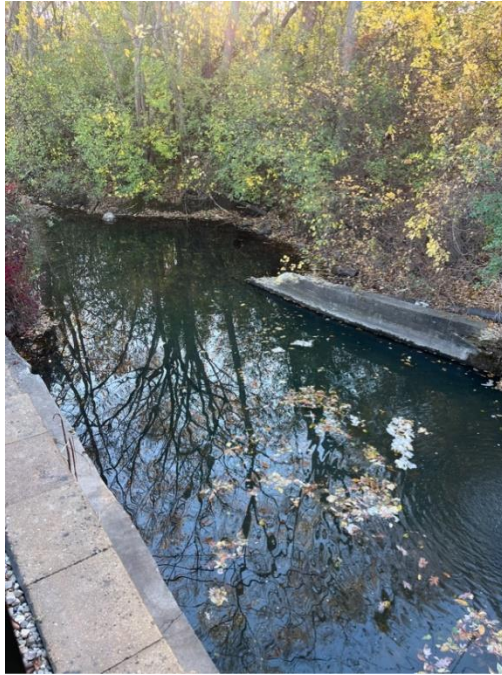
Auxiliary Spillway Outlet Conduit. Note spalling and deterioration of retaining wall on right side.
